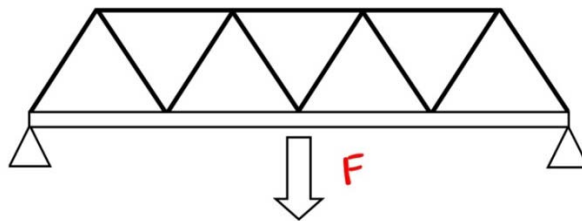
Repetition of triangular arrangement of elements in a truss bridge.
